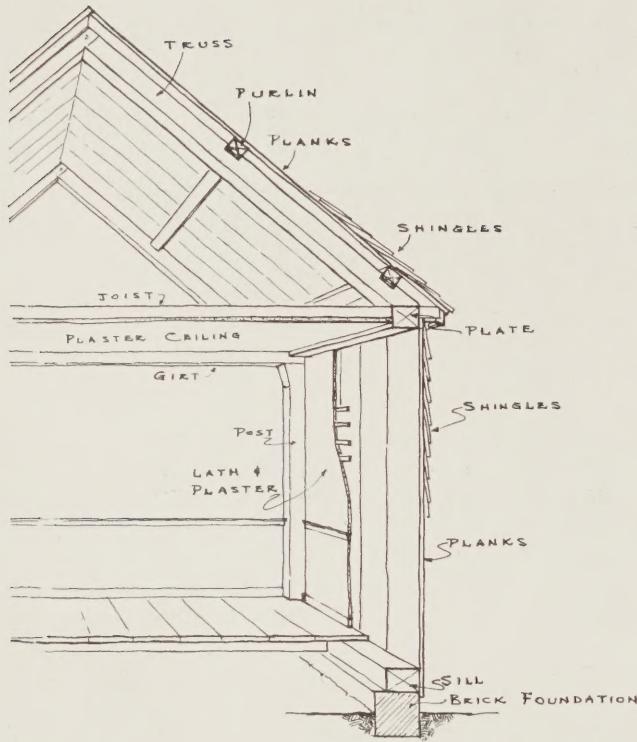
Sketch of typical plank construction observed in the traditional houses of Lower Cape Cod (author).
